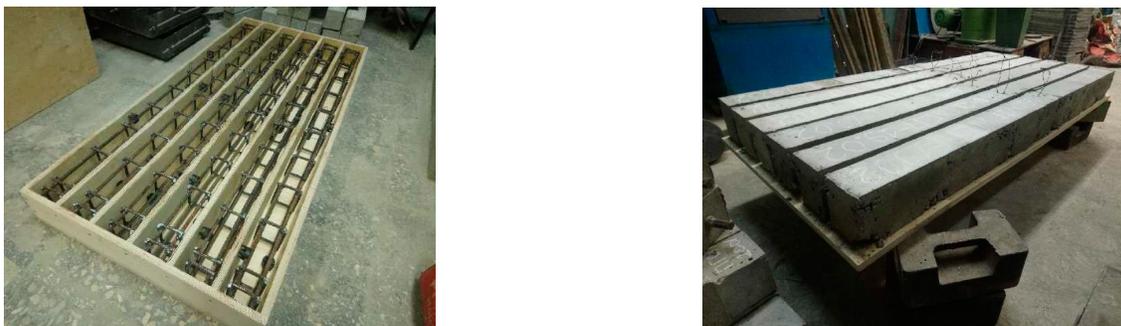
Formwork with reinforcement (left) and test 6 beams (right)
